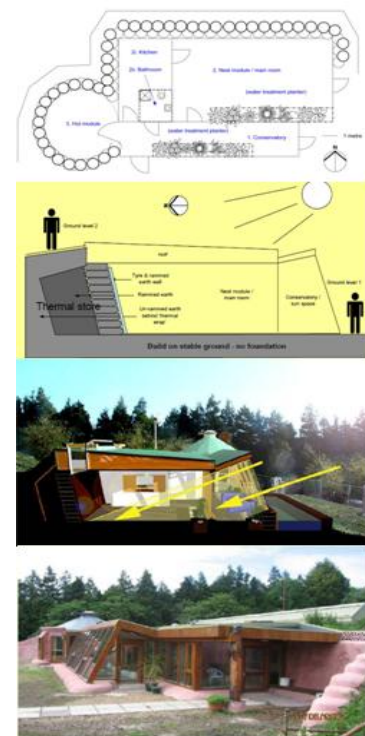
14: The Brighton Earth ship is located in Stammer Park (floor plan, section and perspective) (Ip and Miller, 2006 and 2009)
